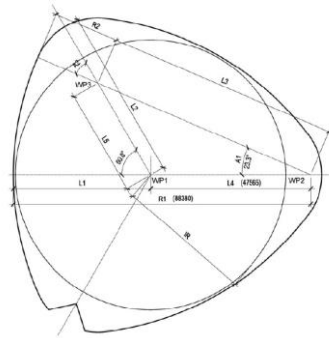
Horizontal profile geometry (*Shanghai Tower Façade Design Process, 2010*)
